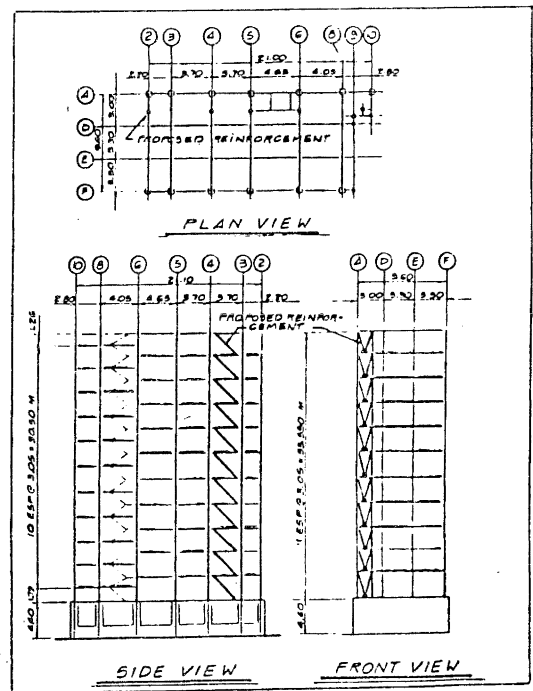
REPAIR FOR AMSTERDAM BUILDING
